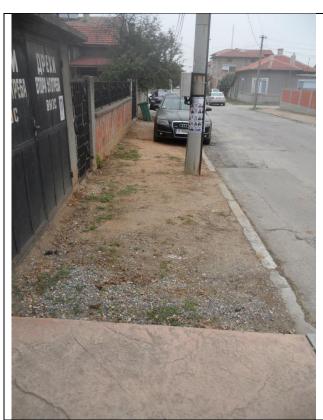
Missing sidewalk flooring and parked vehicle /. Липсваща тротоарна настилка и паркиран автомобил
